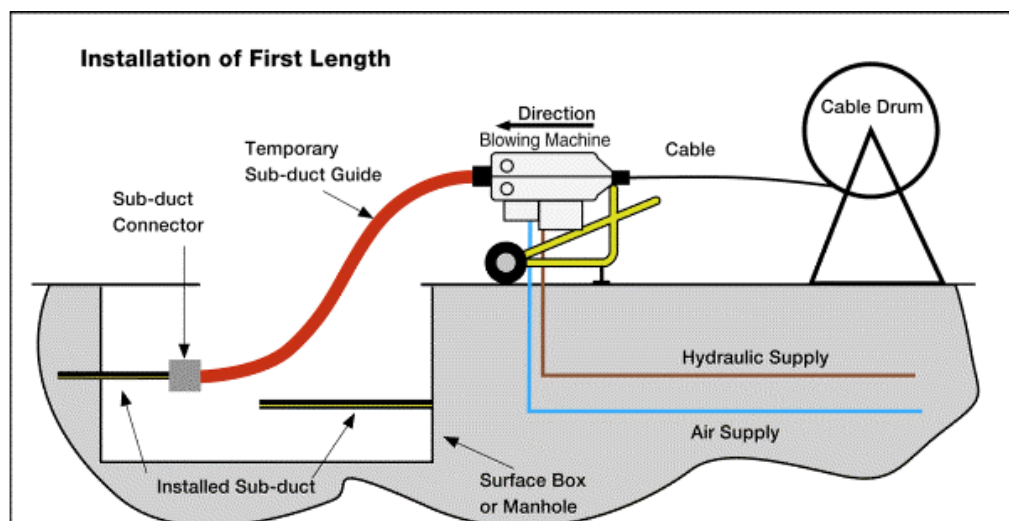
Schematic diagram showing correct position of plant and equipment for end to end installation
